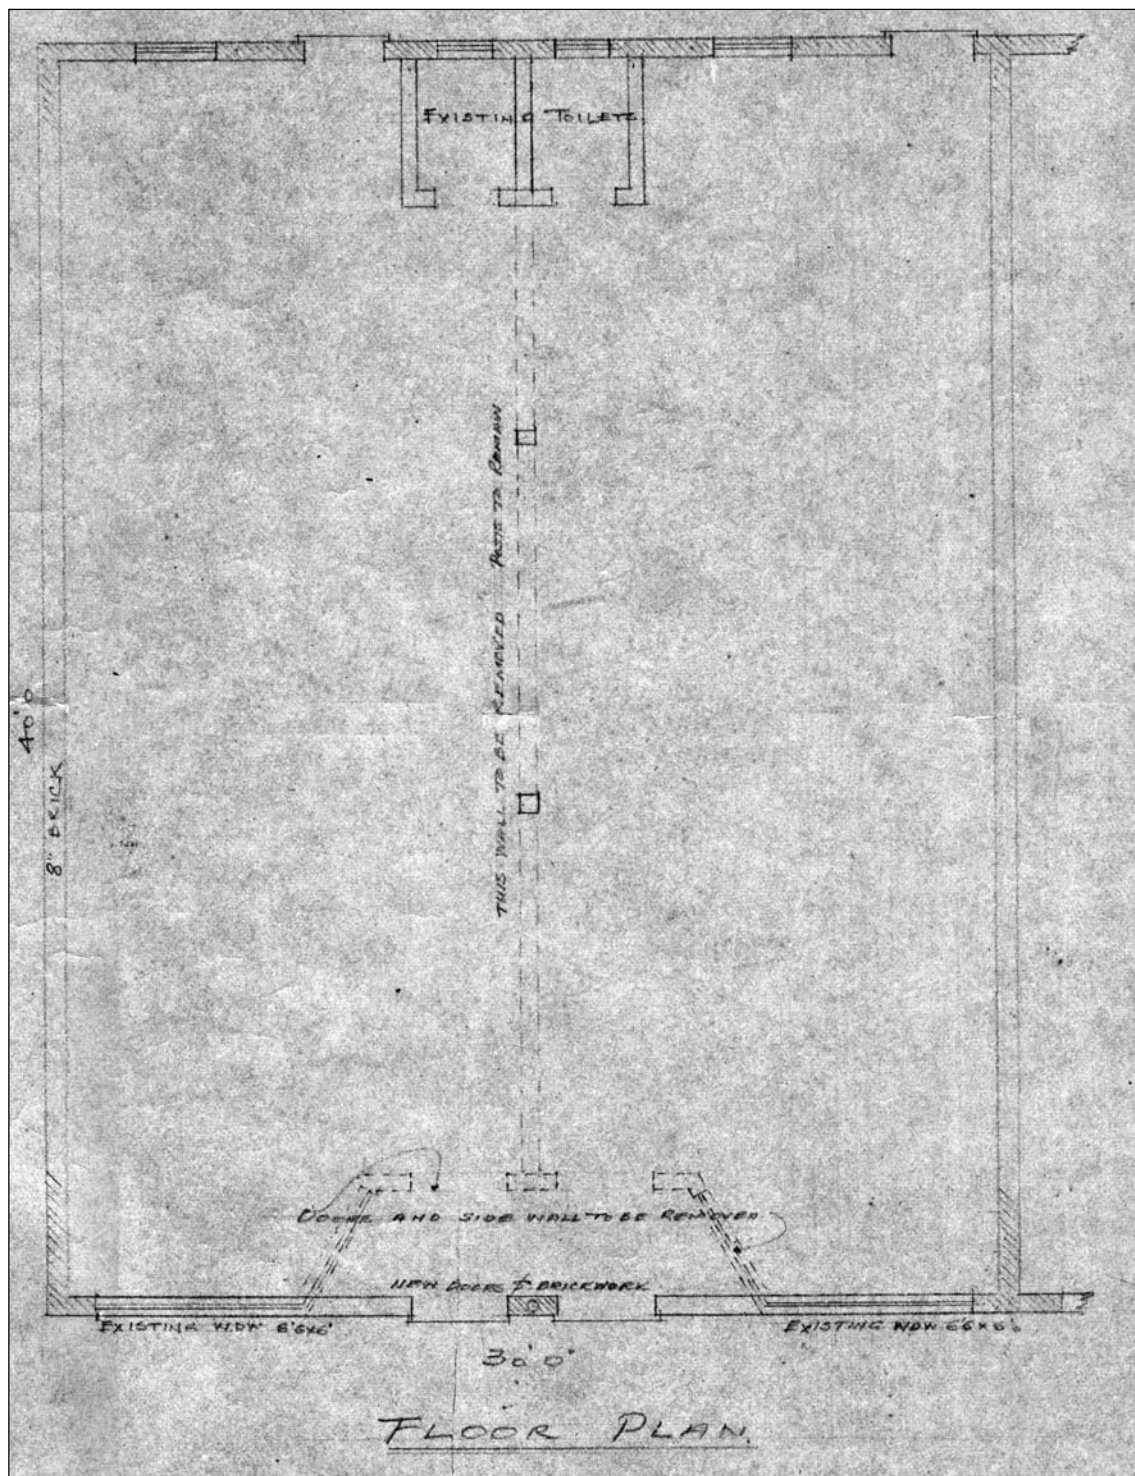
Architect's plans, #738/1952, "Floor Plan." (Courtesy of City Archives.)
